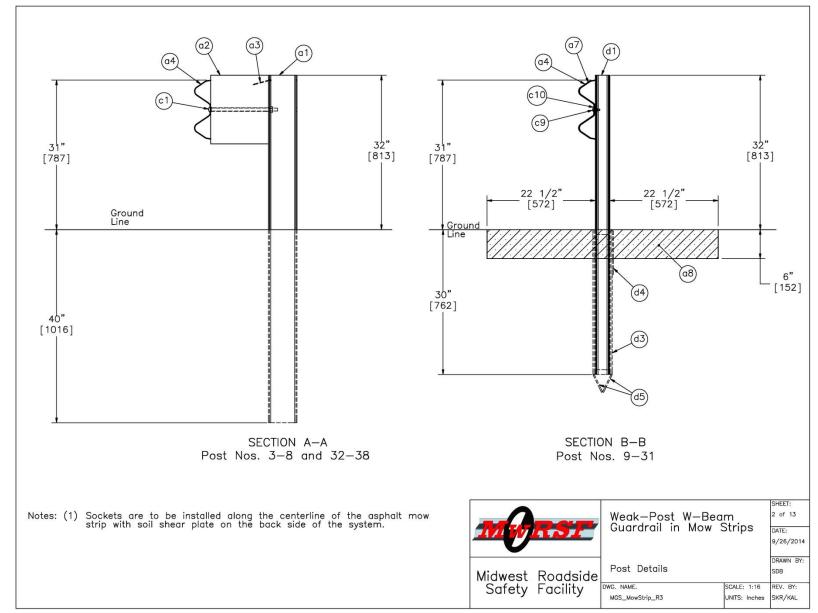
Guardrail Post Details, Test No. MGSMS-1
